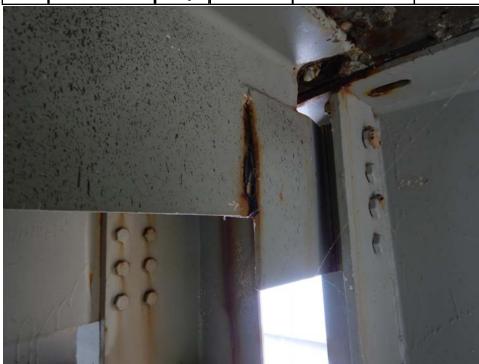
Looking north at girder 1, span 6 at the upper longitudinal stiffener splice near floor beam 7. Note: crack in splice on free edge side of cored hole.
